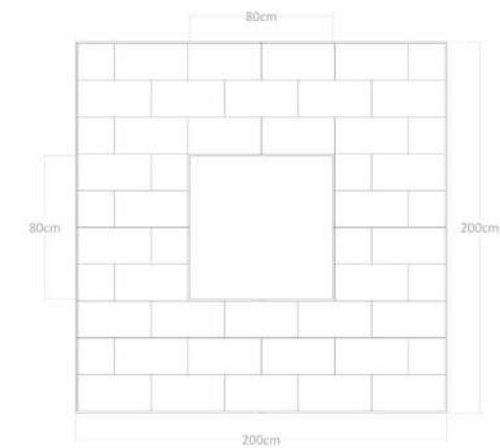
Recessed metal tree grille with paving infill - plan view
